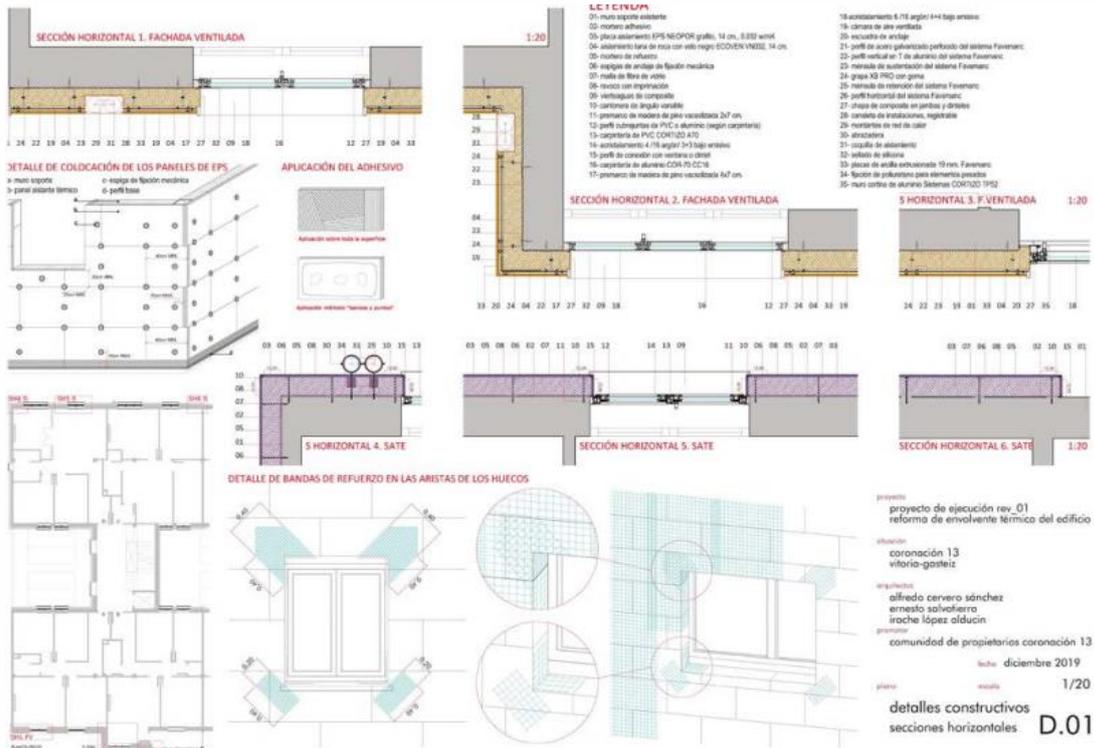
Example of detailed plan. Façade insulation at Coronación 13. Source: A. Cervero, I. López and E. Salvatierra
